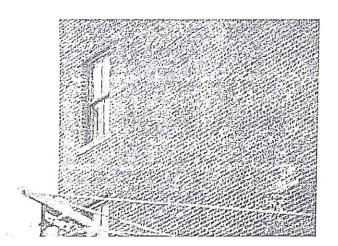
The damp brick areas extend down the west end of the south wall several stories.
